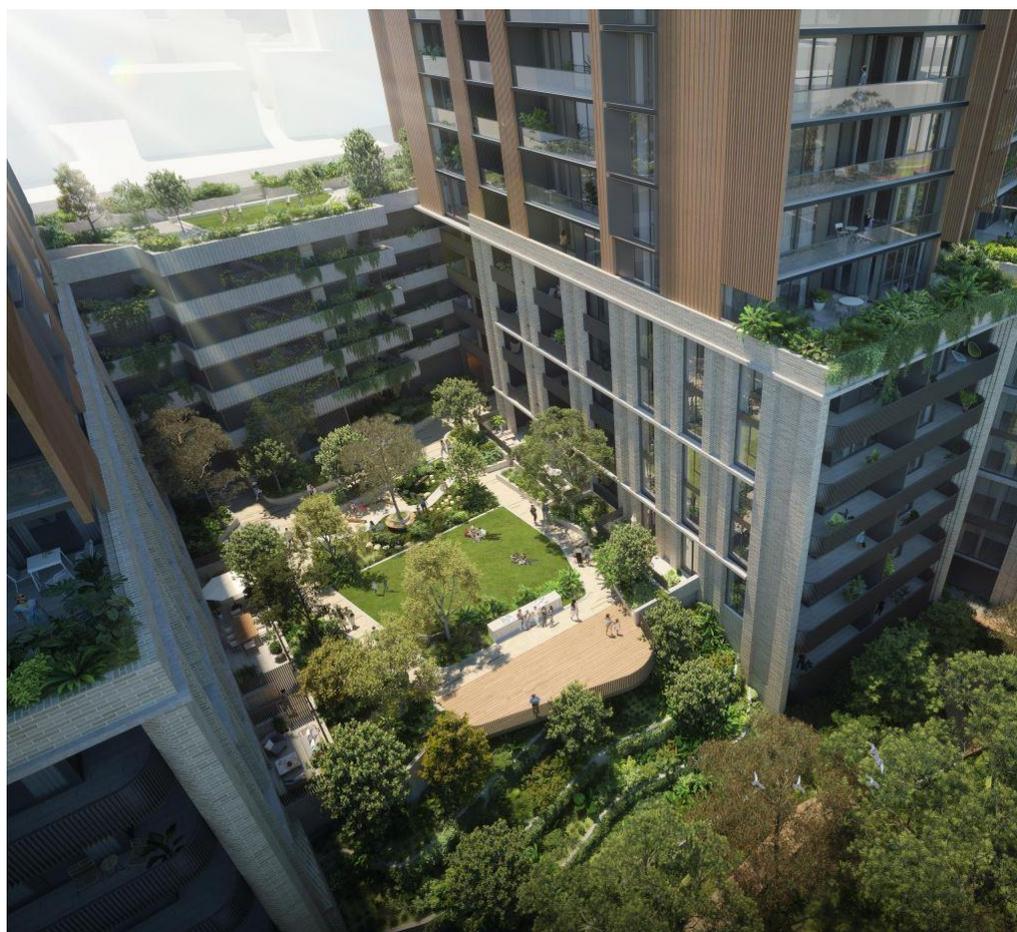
| Perspective view of ground level private open space between Buildings C and E (Source: Applicant's RTS)
